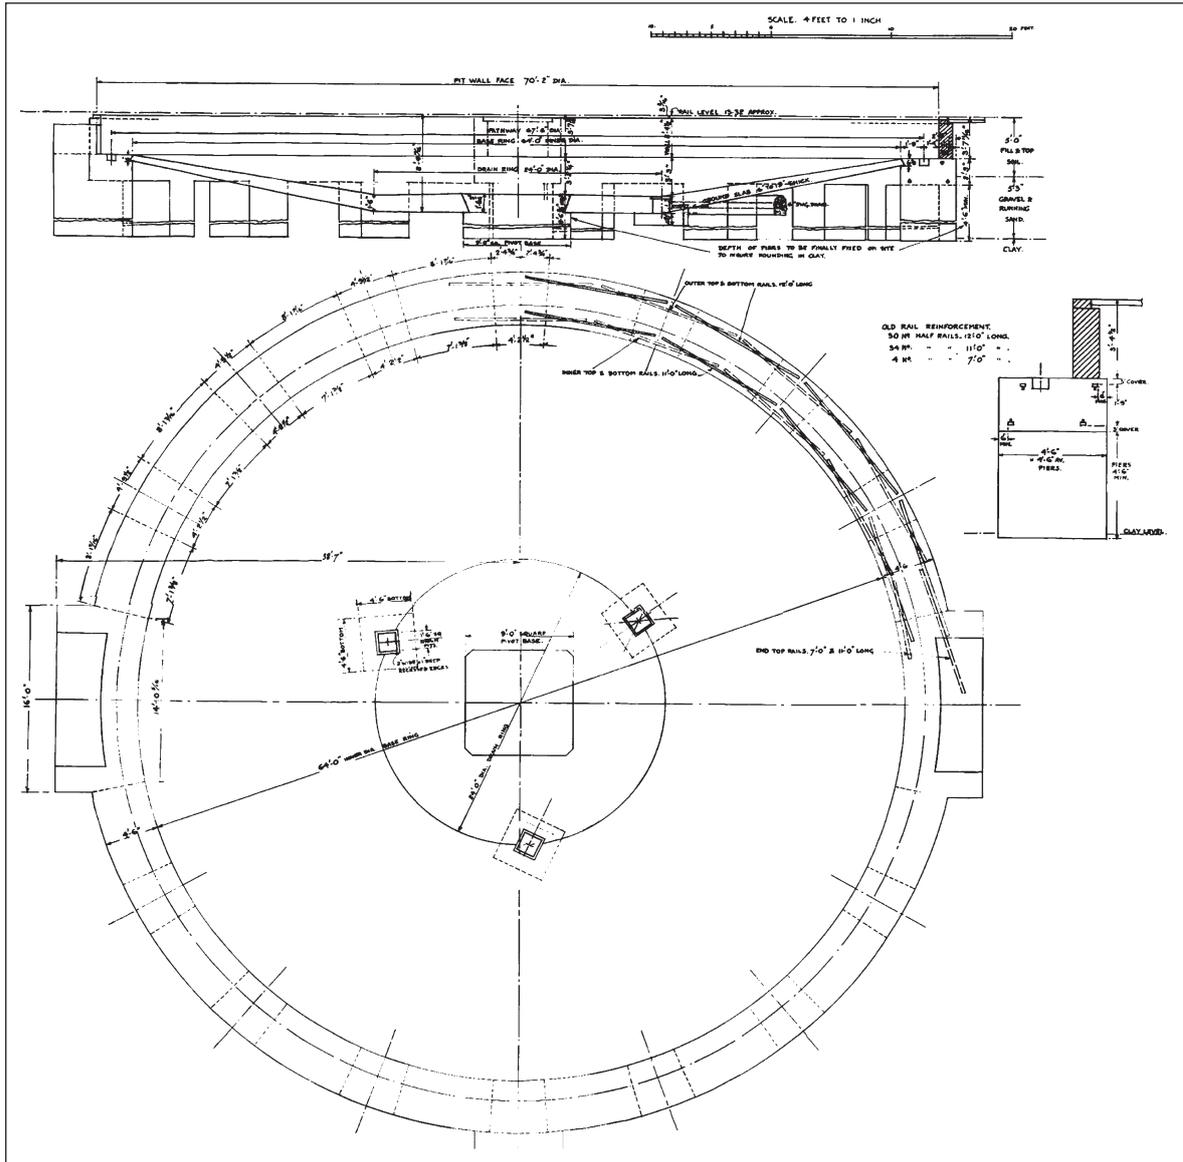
Plan of the new turntable, 1944. (Courtesy of Network Rail).
